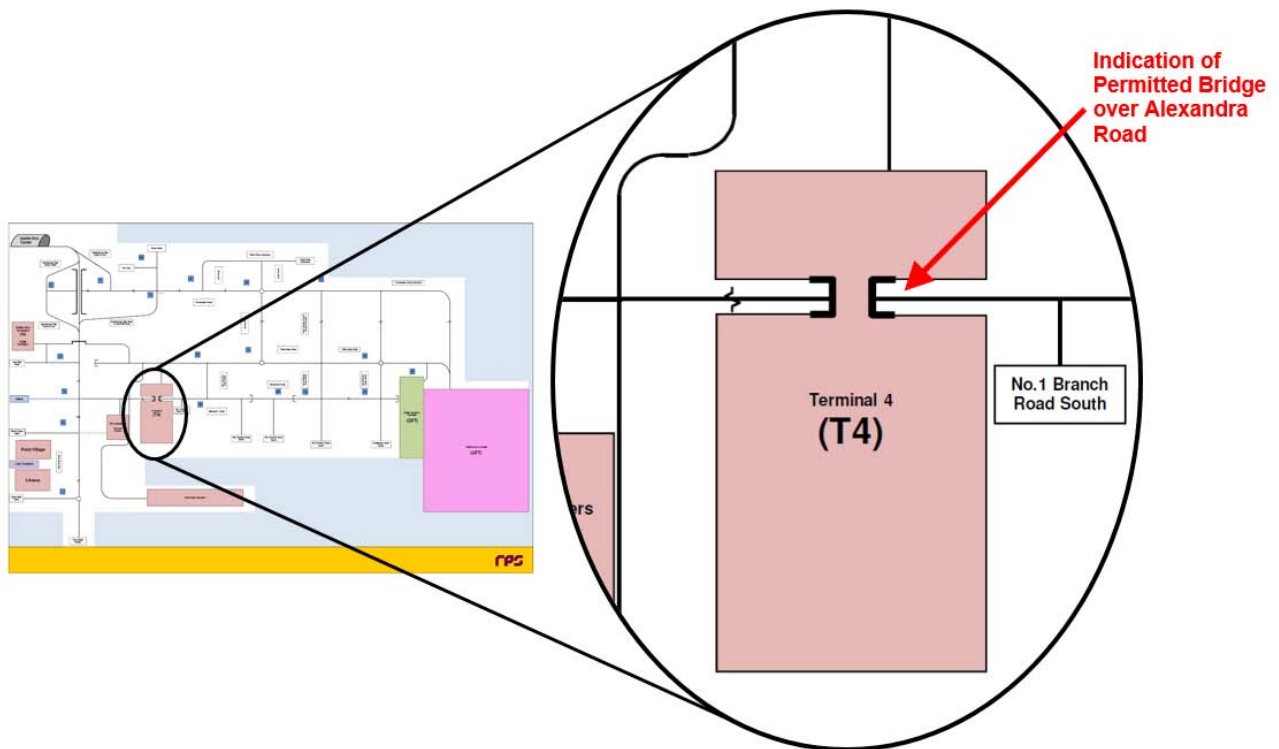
Permitted Bridge over Alexandra Road incorporated into Proposed Traffic Flows
